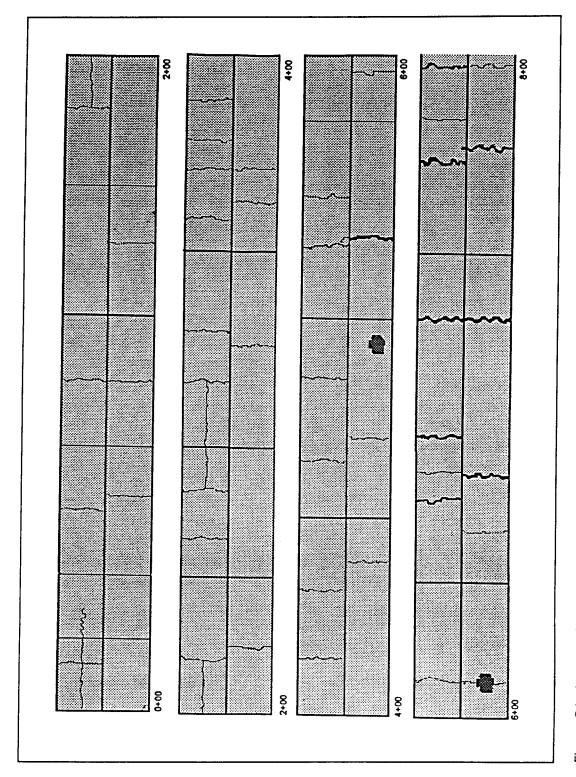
Layout of sawed joints and cracks 7 months after placement. (Note: the two areas shown at about 5+10 and 6+10 are areas of surface raveling.) (Continued)
